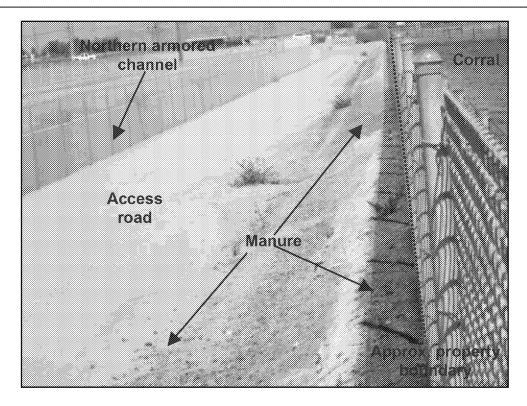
View facing north from the Facility concrete spillway in the southwest corner of basin No. 1.
